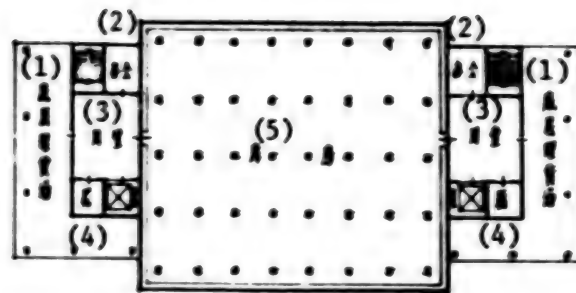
"Single Unit" Type Warehouse, Elevators Are Scattered Outside the Warehouse
